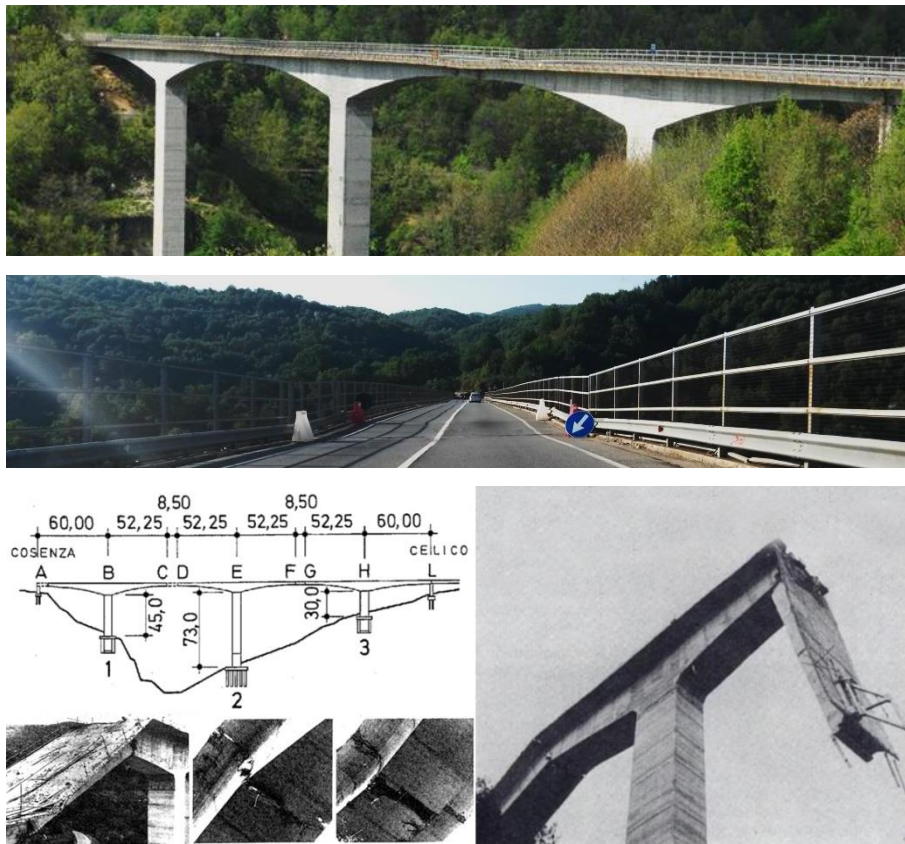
The Cannavino bridge. The present situation, a quoted elevation and photo of collapse (1972)
